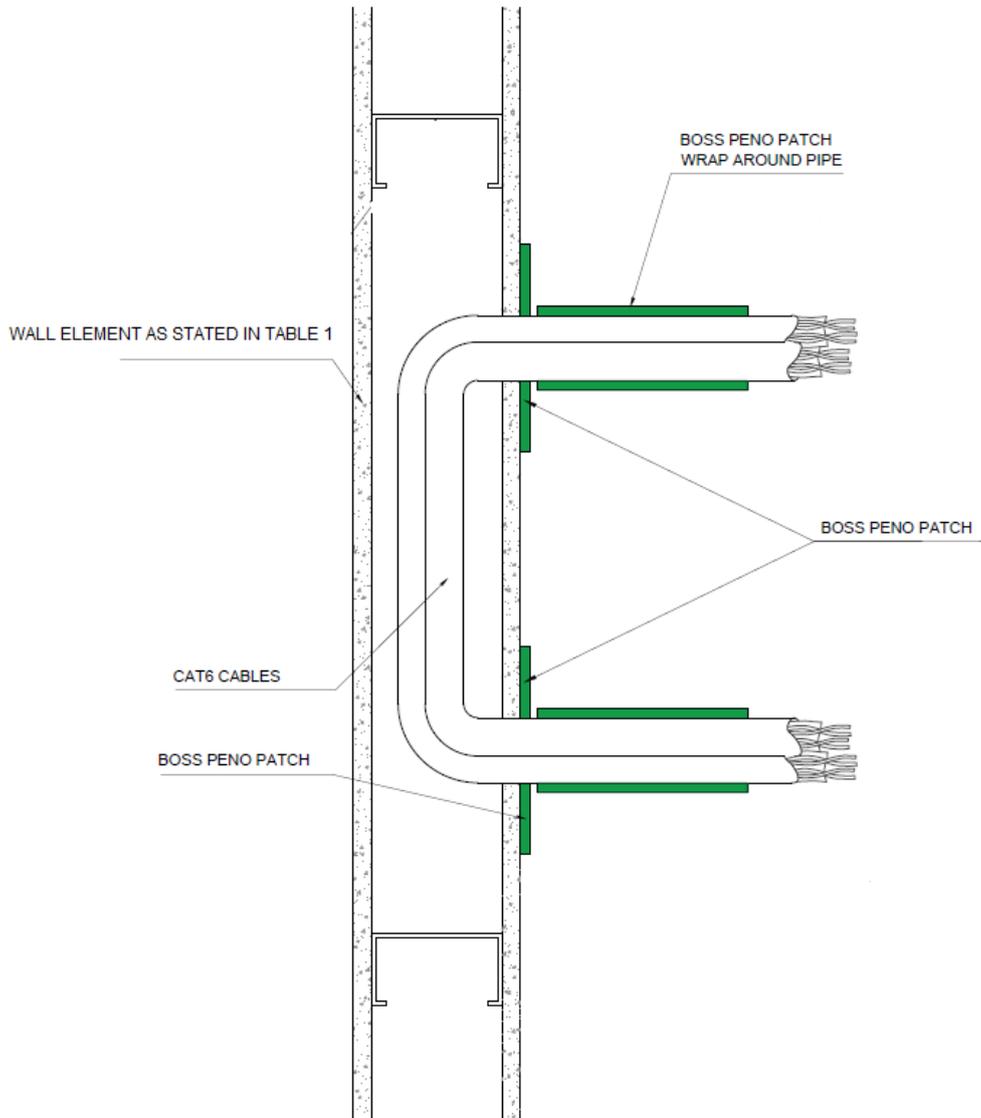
CAT6 cable bundle (up to 3 cables) penetrating the wall without exiting to the other side
